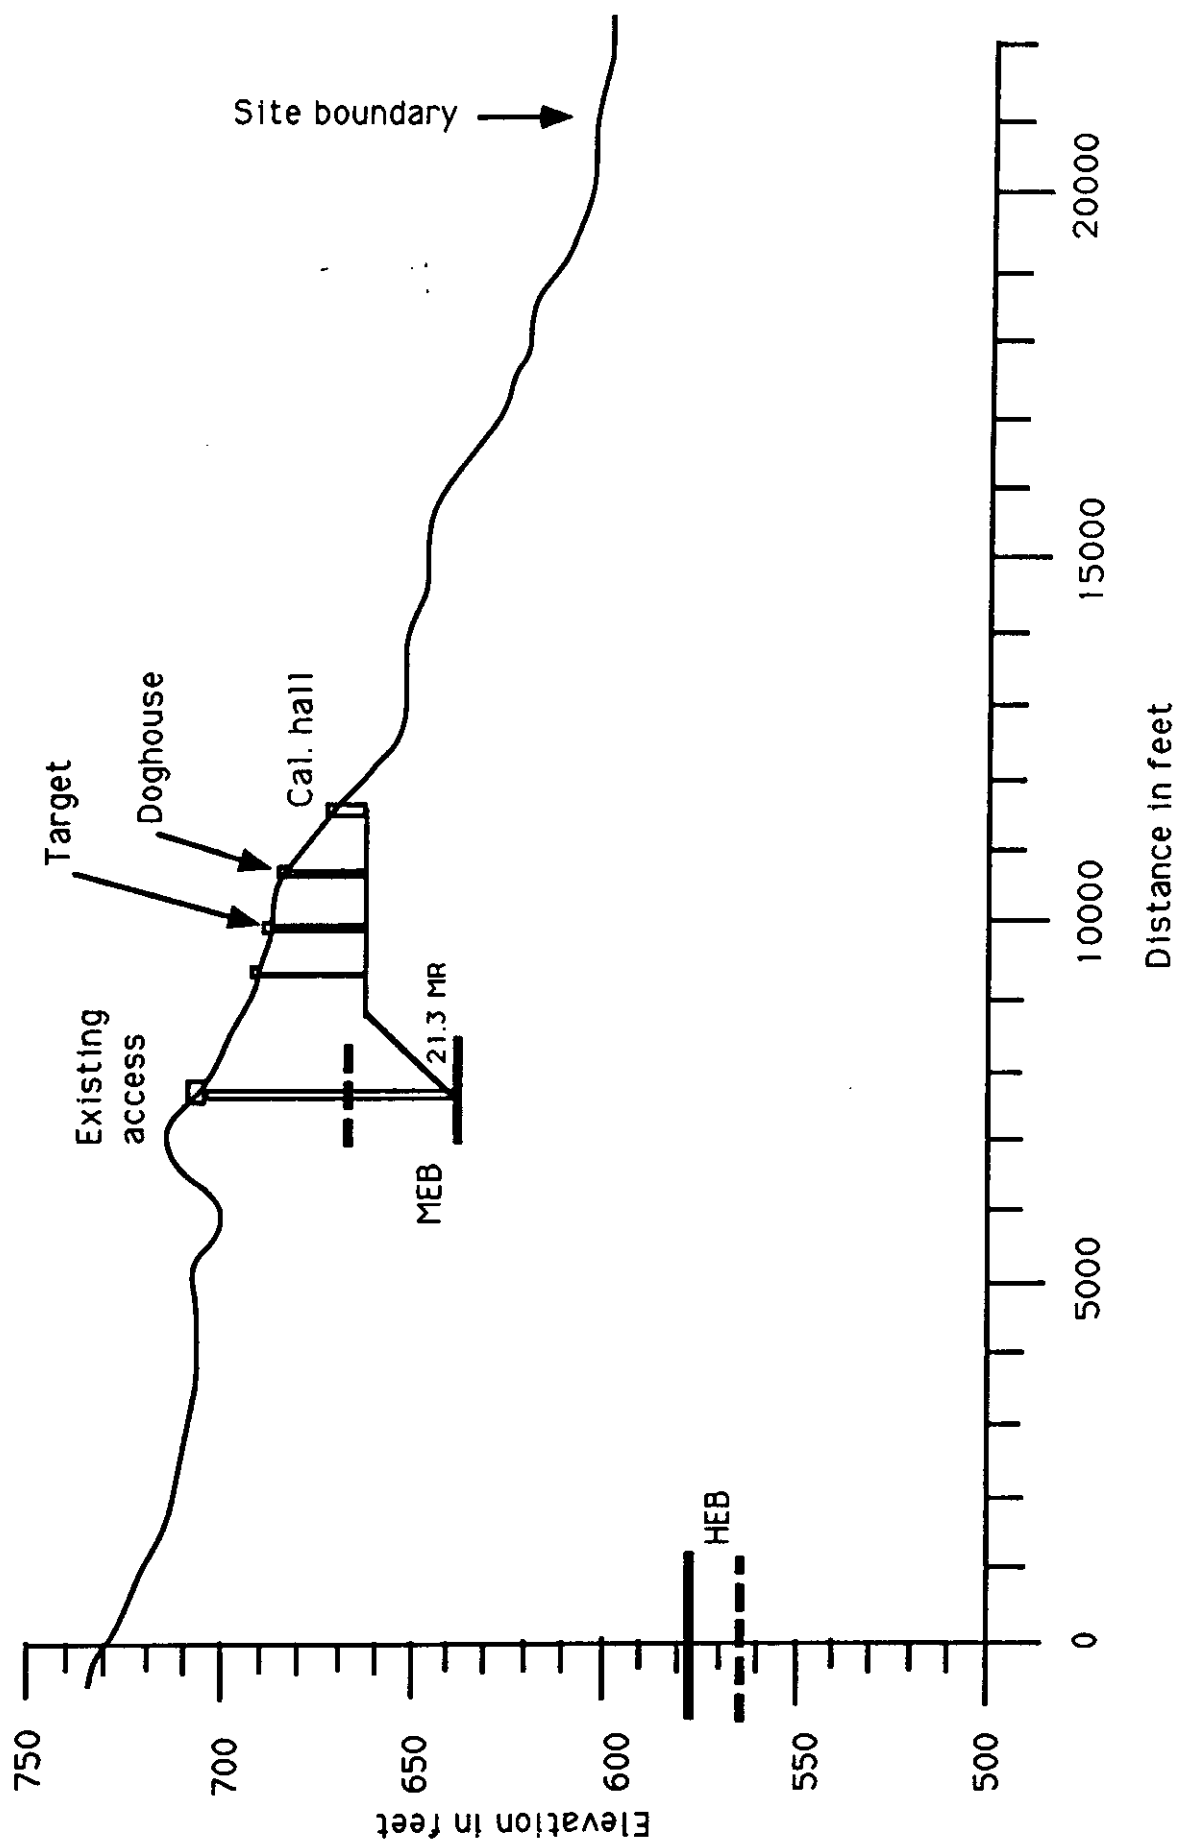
Elevation view of short version, accommodating only three 200 GeV beams. The 2 TeV beams would be constructed completely independently.
